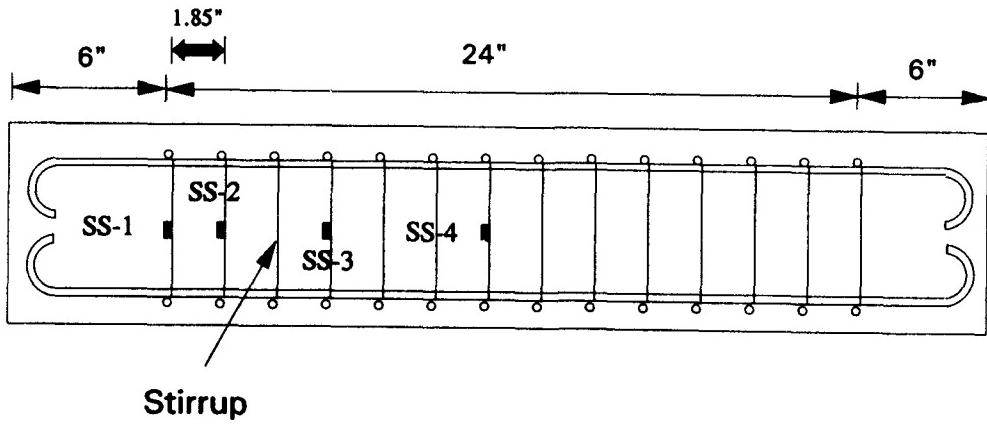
Strain Gage Locations on Stirrups in Slab No. 13
